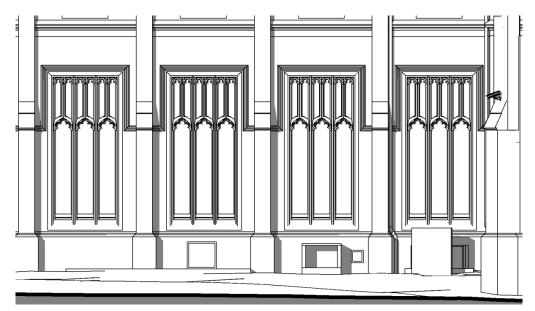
Detail from existing front elevation of college building – showing the part to the north of the entrance, at ground floor level. (See also Figure 75.) Note existing ventilation wall louvre, and existing external condenser plant unit and mesh framed enclosure – all at basement level.
